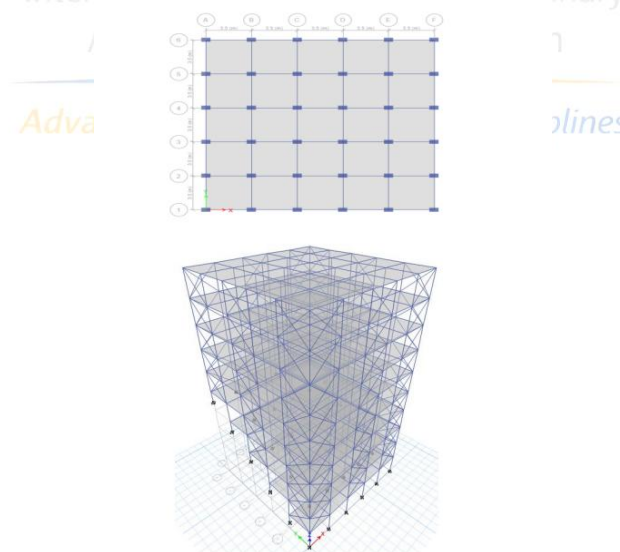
Plan and 3D Model of Sloped Building with X Bracing
